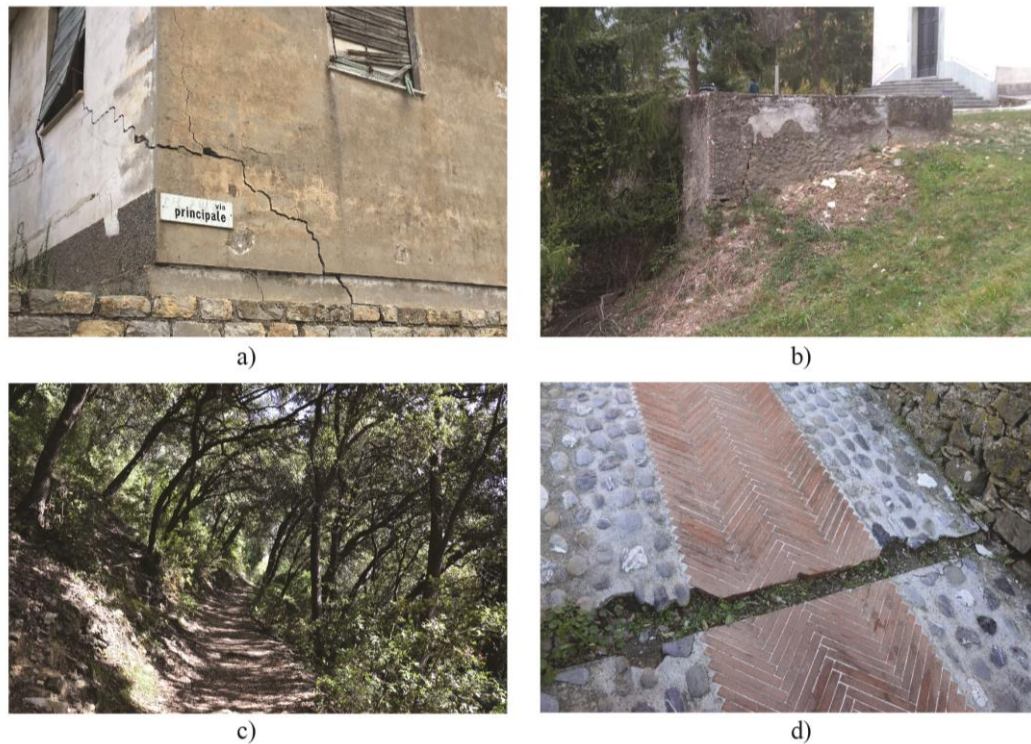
Inspection of the surroundings to detect the presence of soil movements: a) cracks in neighbouring buildings, b) cracks in the retaining wall of the embankment on which the church parvis is resting, c) inclined trees, d) cracking in road surfaces.
